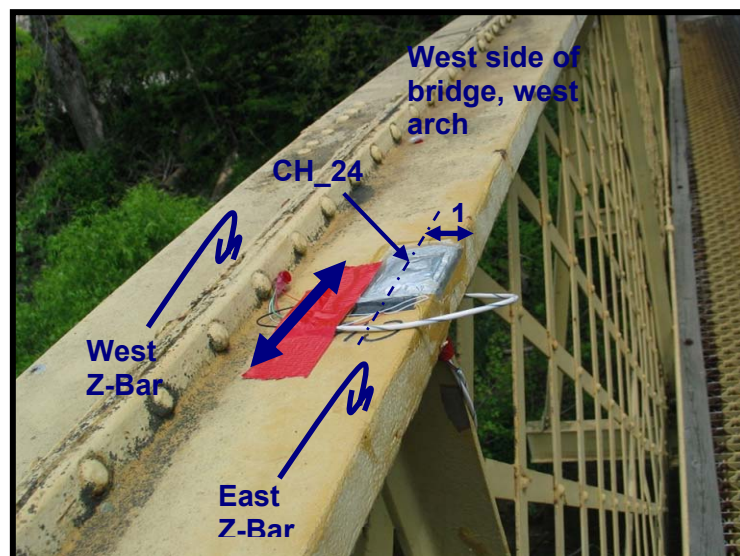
CH\_24 installed on the top face of the east Z-Bar on the west side of the bridge, approximately 1 inch from the edge of the bars and 3 inches south of floorbeam 8 (View looking north)
